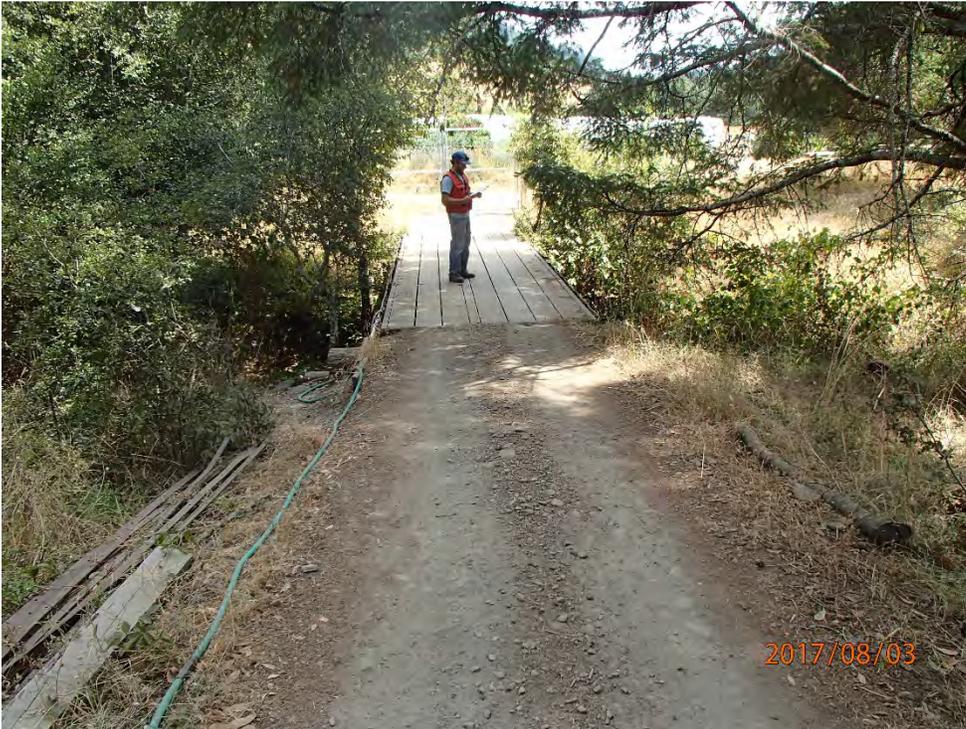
; MP #10 – View of Flatcar bridge crossing at SC #3, from right road approach. (Photo August 2017).
